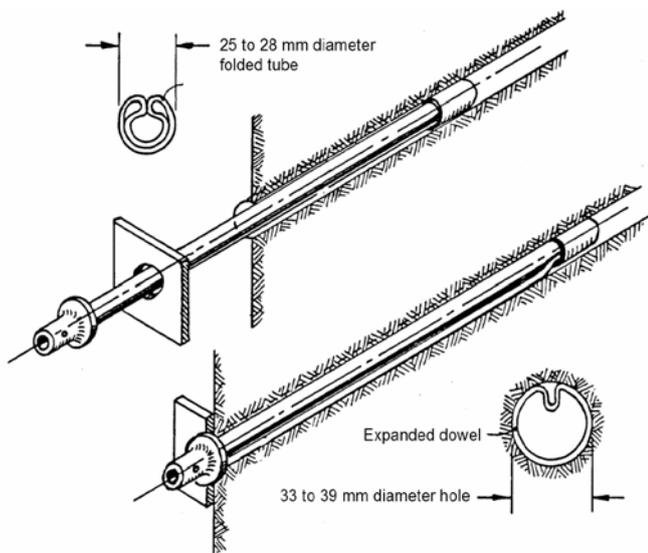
Details of the Swellex frictional anchor (Atlas Copco Construction and Mining Ltd.)
